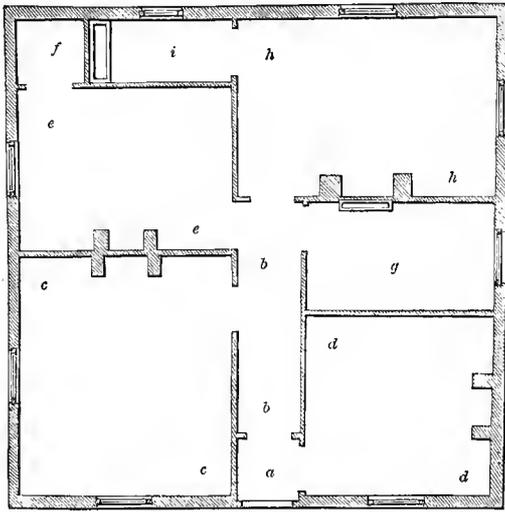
Ground-plan of a single-storeyed detached cottage—scale, three-sixteenths of an inch to the foot.
